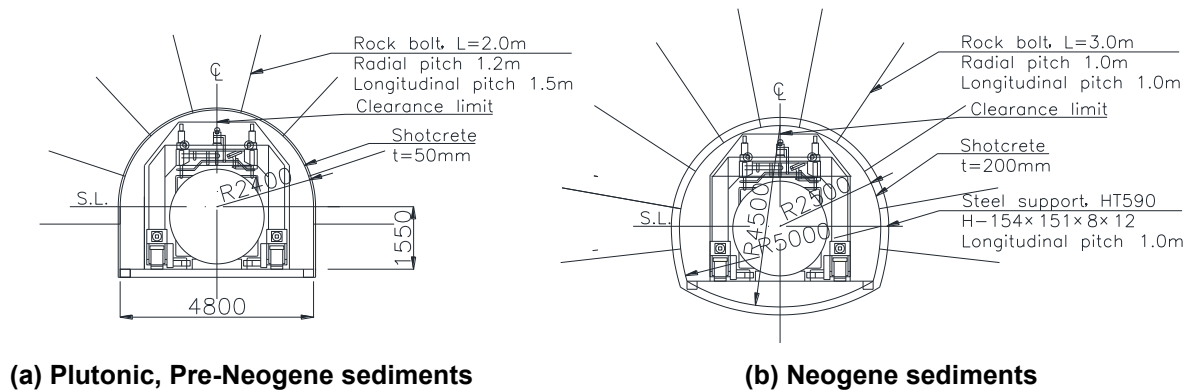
Disposal tunnel size, cross section and support (PEM)
